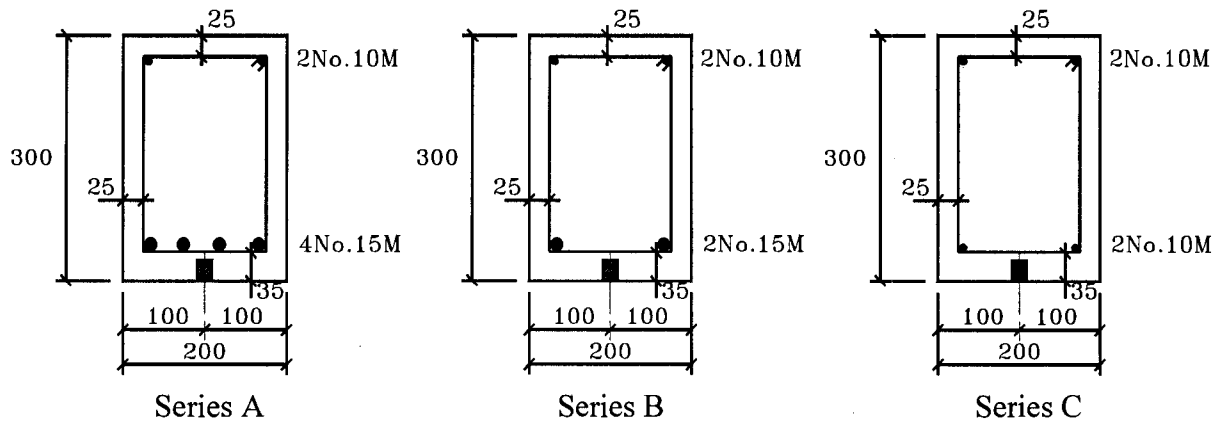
Dimensions and reinforcement details of the beam test specimen
